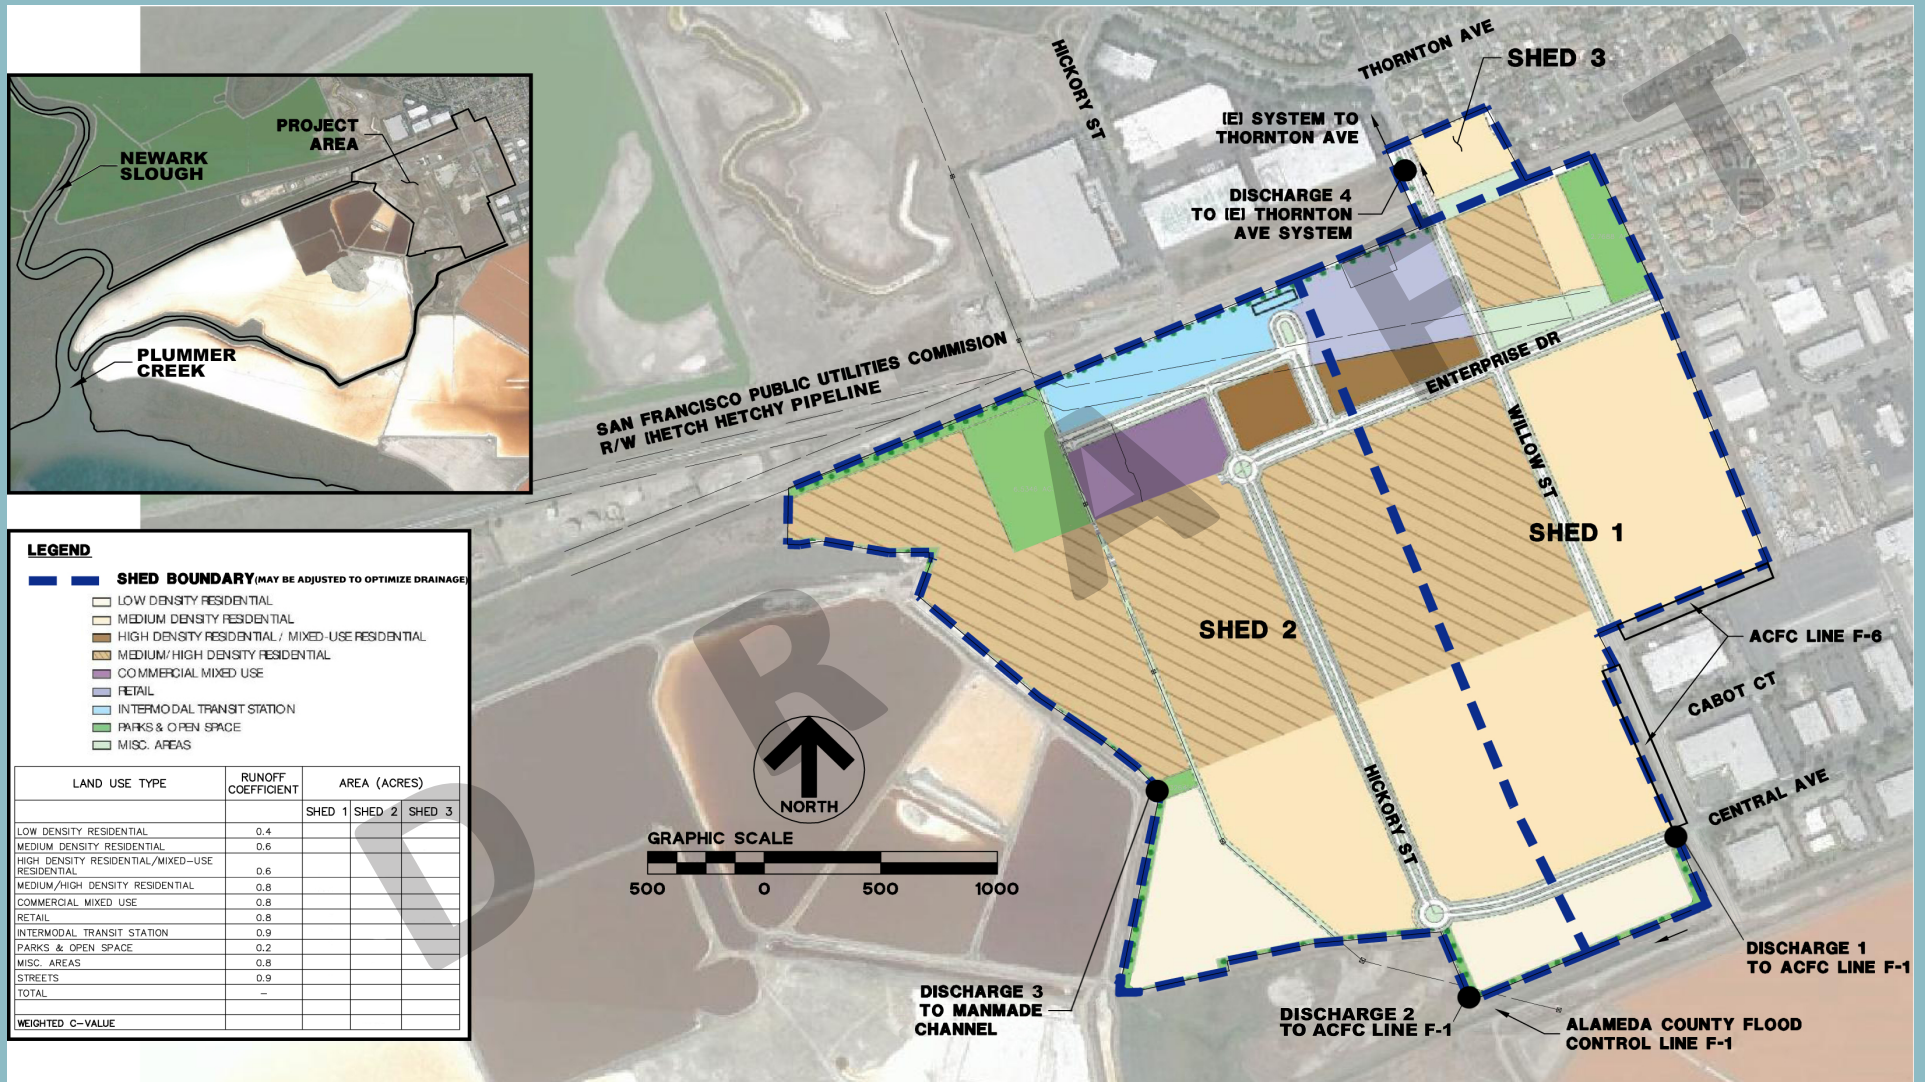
Conceptual Drainage / Shed Plan
